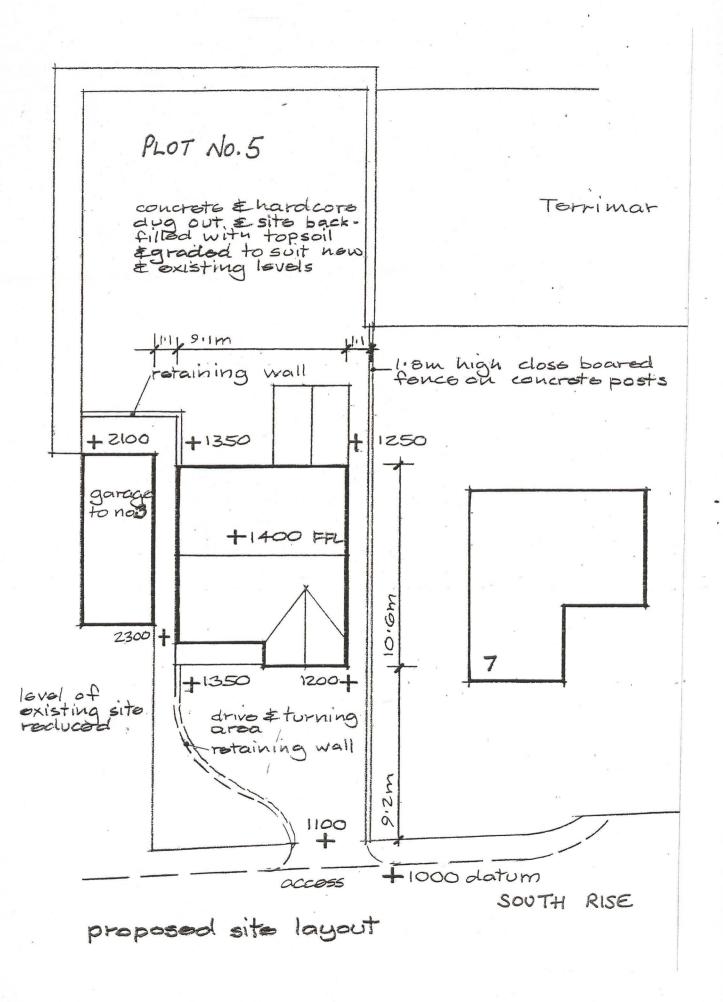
Plot no.5, South Rise, Binbrook: Proposed layout of development (Architect's Plan, scale 1:200).
